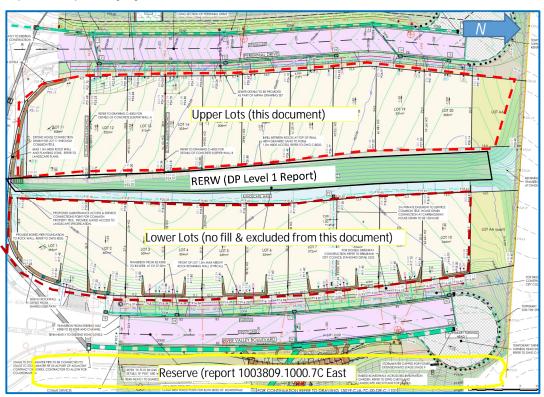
Stage 7C – extract from CJ Arms drawing 'Detailed Layout Plan'
